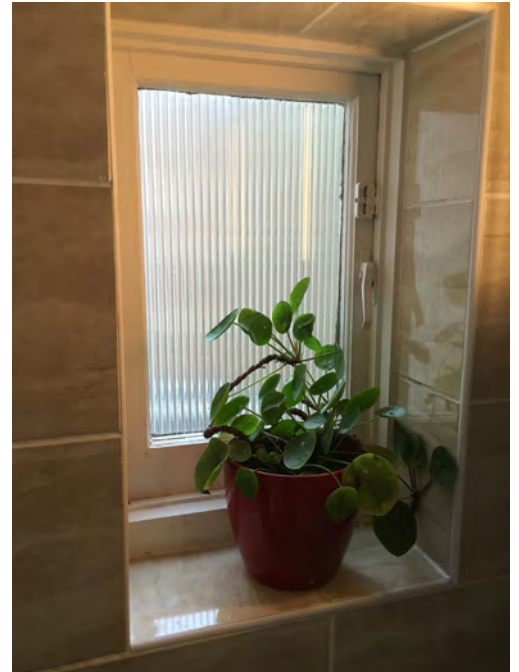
First Floor Internal view of the window in the closet wing extension looking out over the side passage
